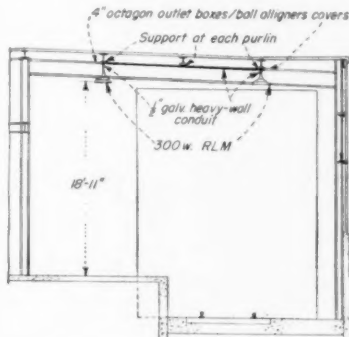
Typical method of installing incandescent lighting fixtures in the receiving, shipping and storage departments.
